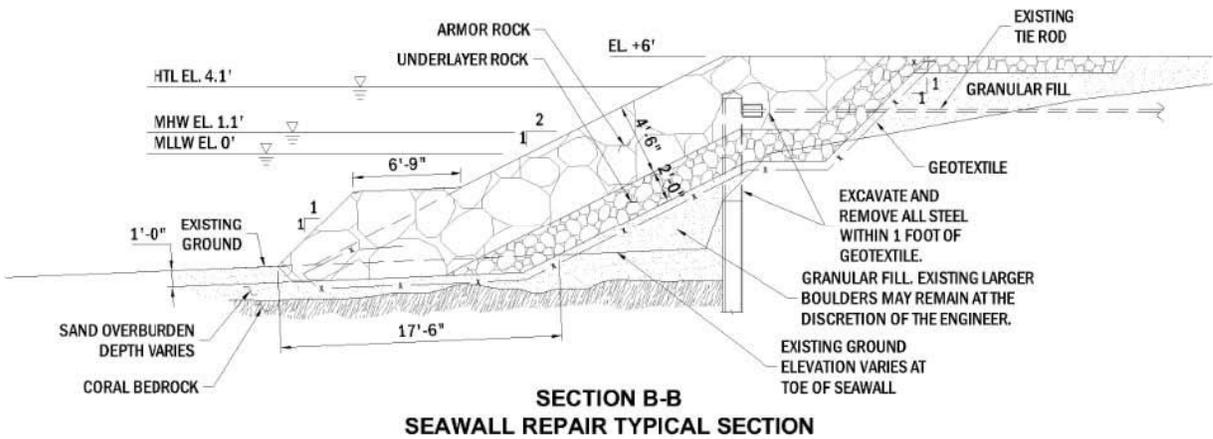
Cross-section of typical repair, note that original seawall will remain in place.
